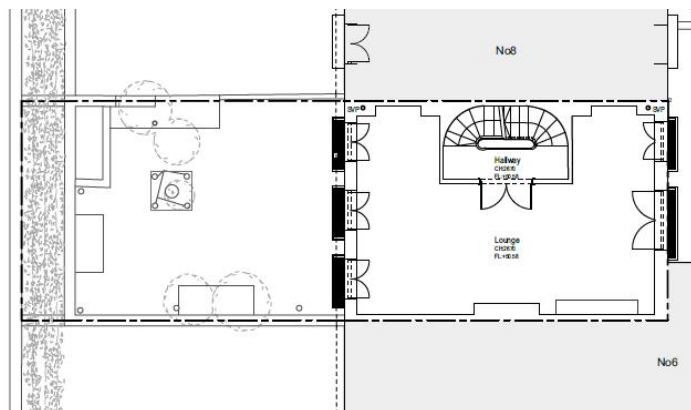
EXISTING FIRST FLOOR PLAN
